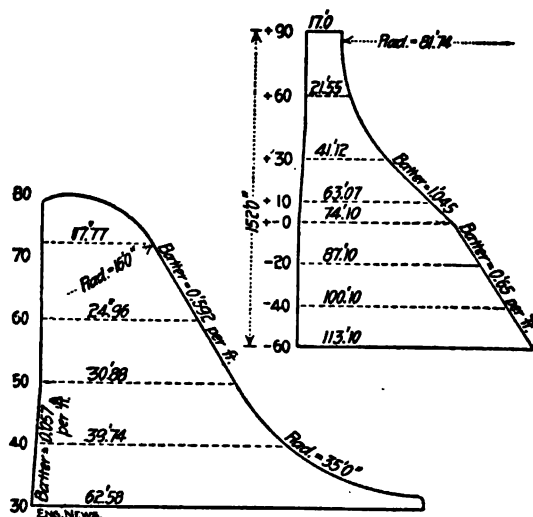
SPIER FALLS DAM, N. Y. PROFILES OF OVERFALL AND ABUTMENT SECTIONS.
